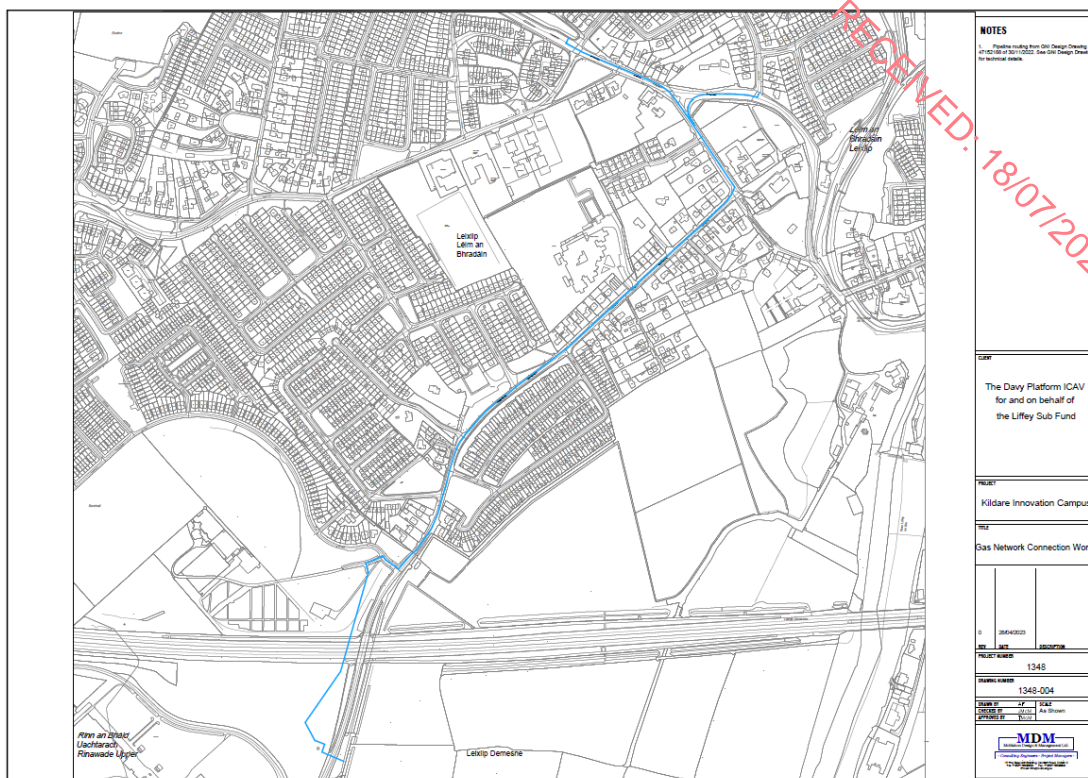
Indicative Route for Upgraded Gas Connection. Source: MDM Engineering Drawing No. 1348-004 (Refer to Appendix 2.1).
